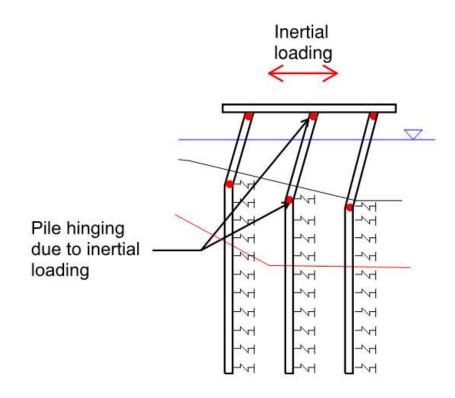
Typical Pile Hinge Locations for Inertial Loading
